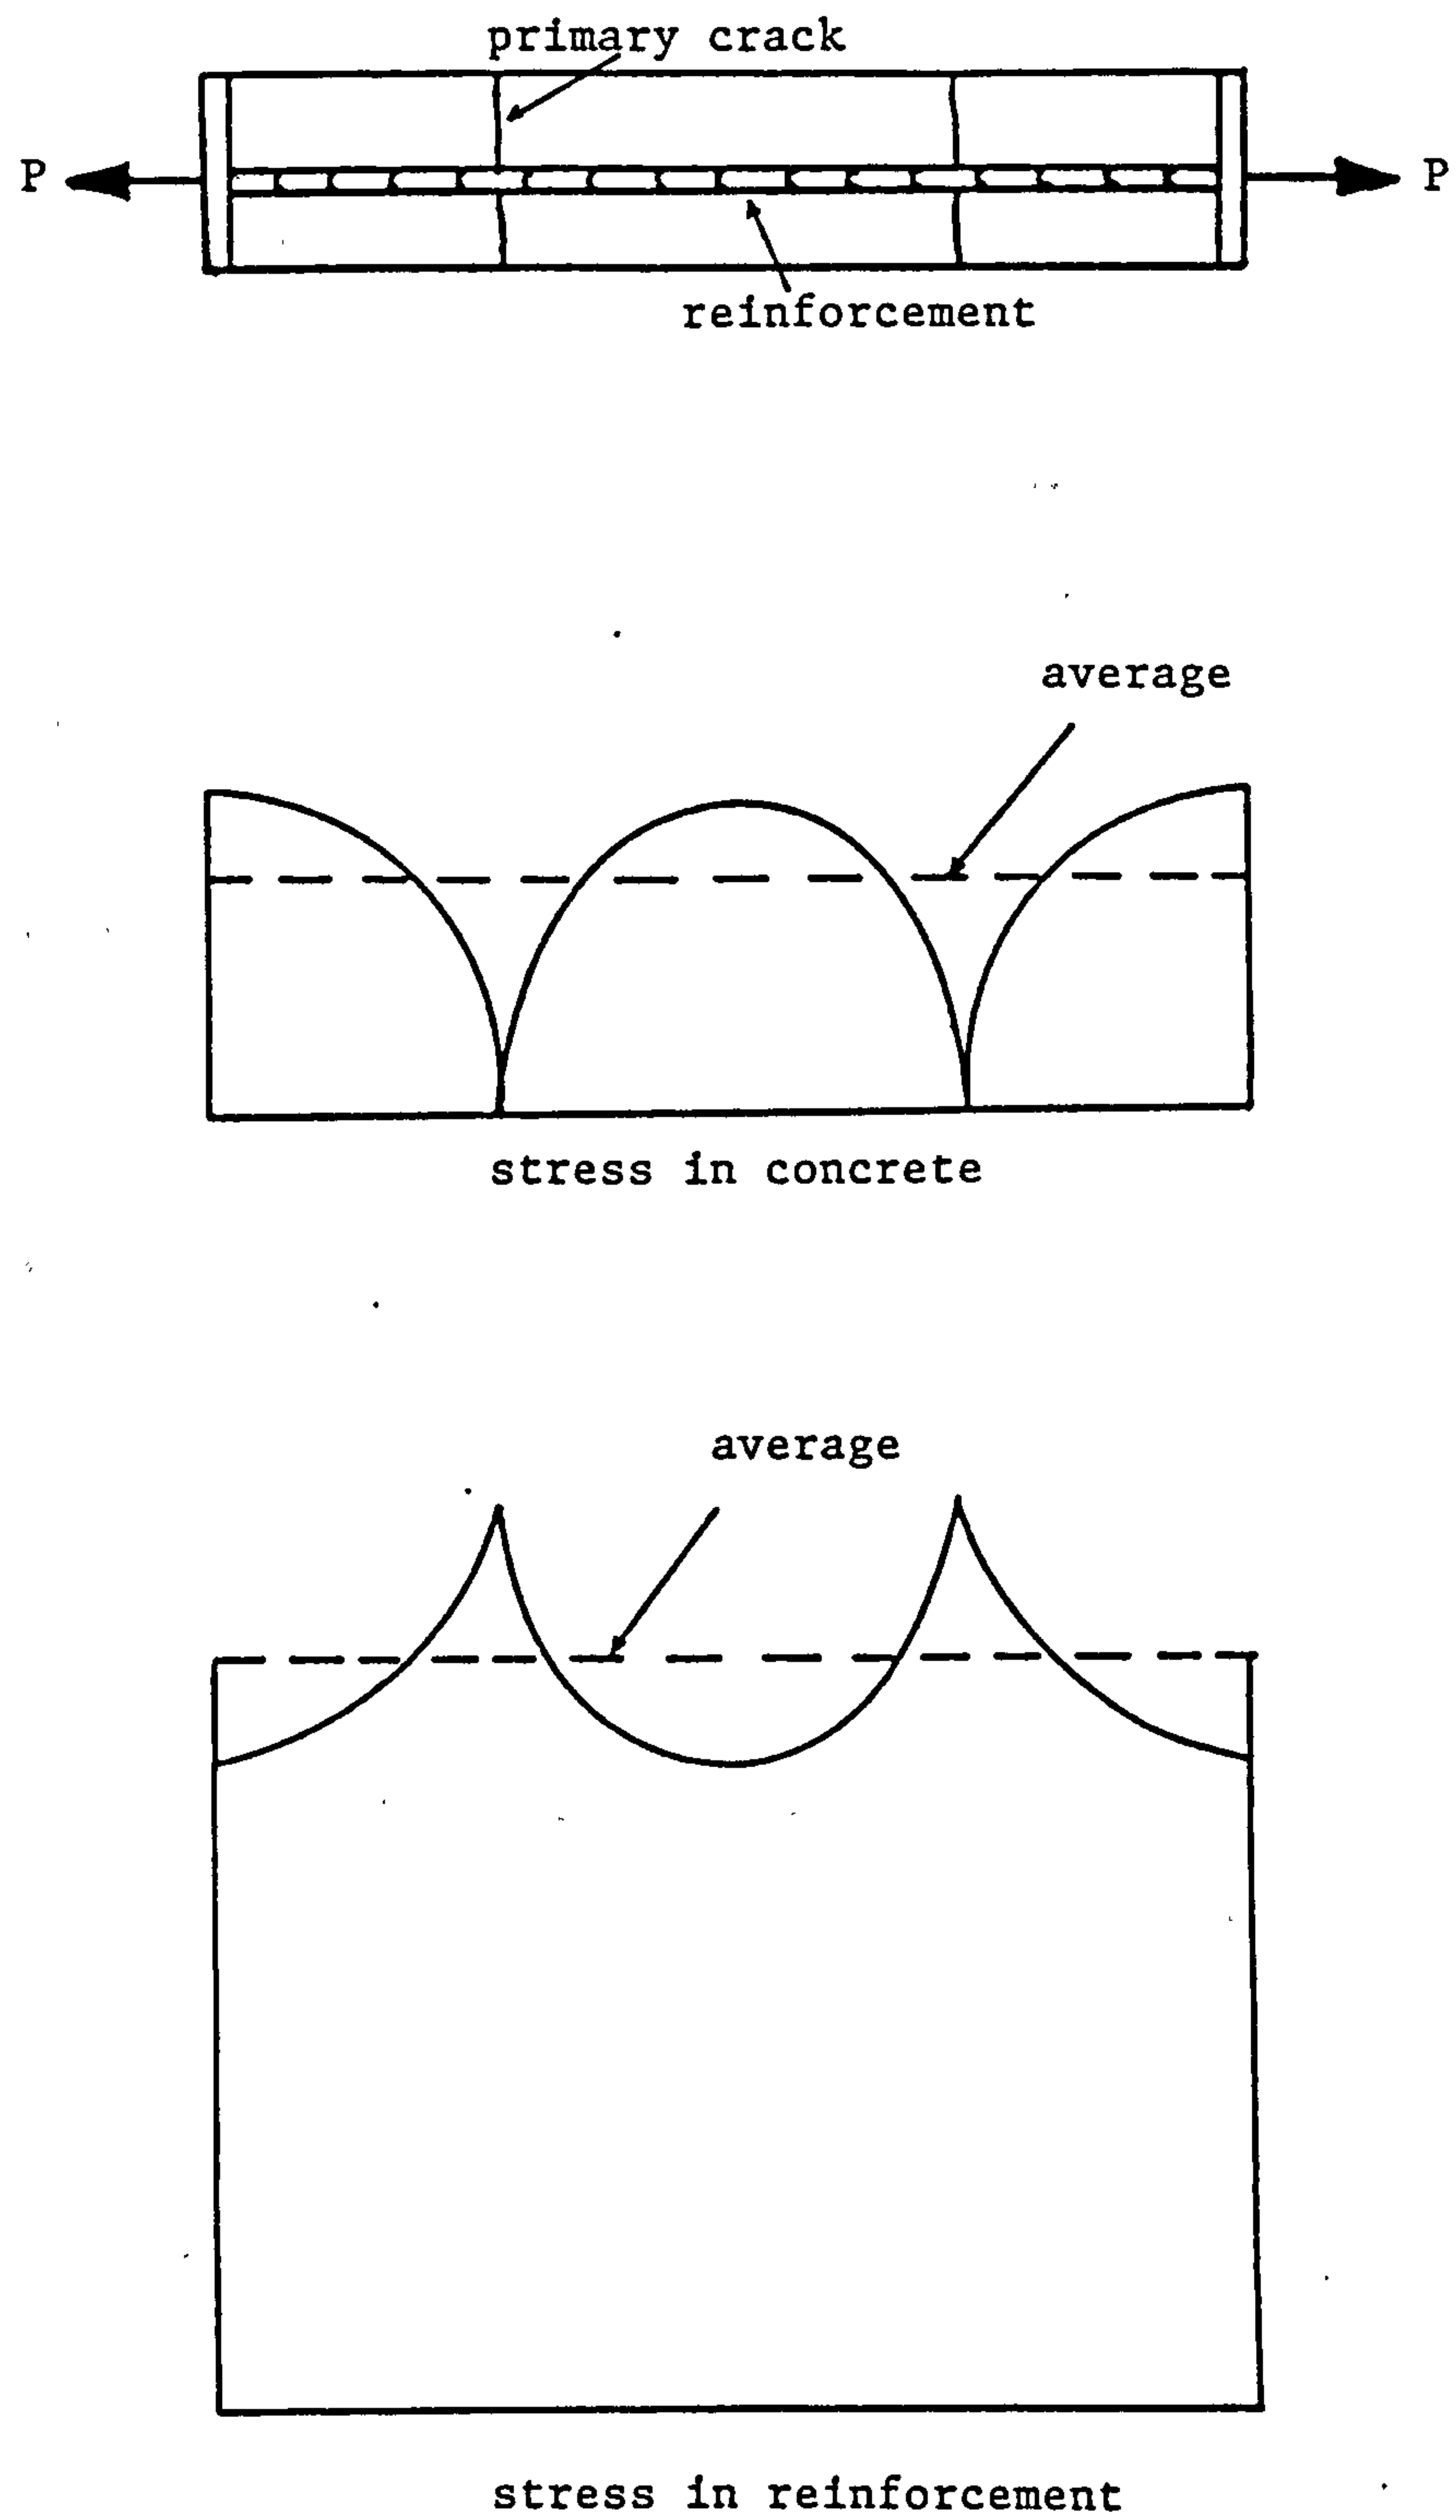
Stress distribution in a cracked reinforced concrete element
